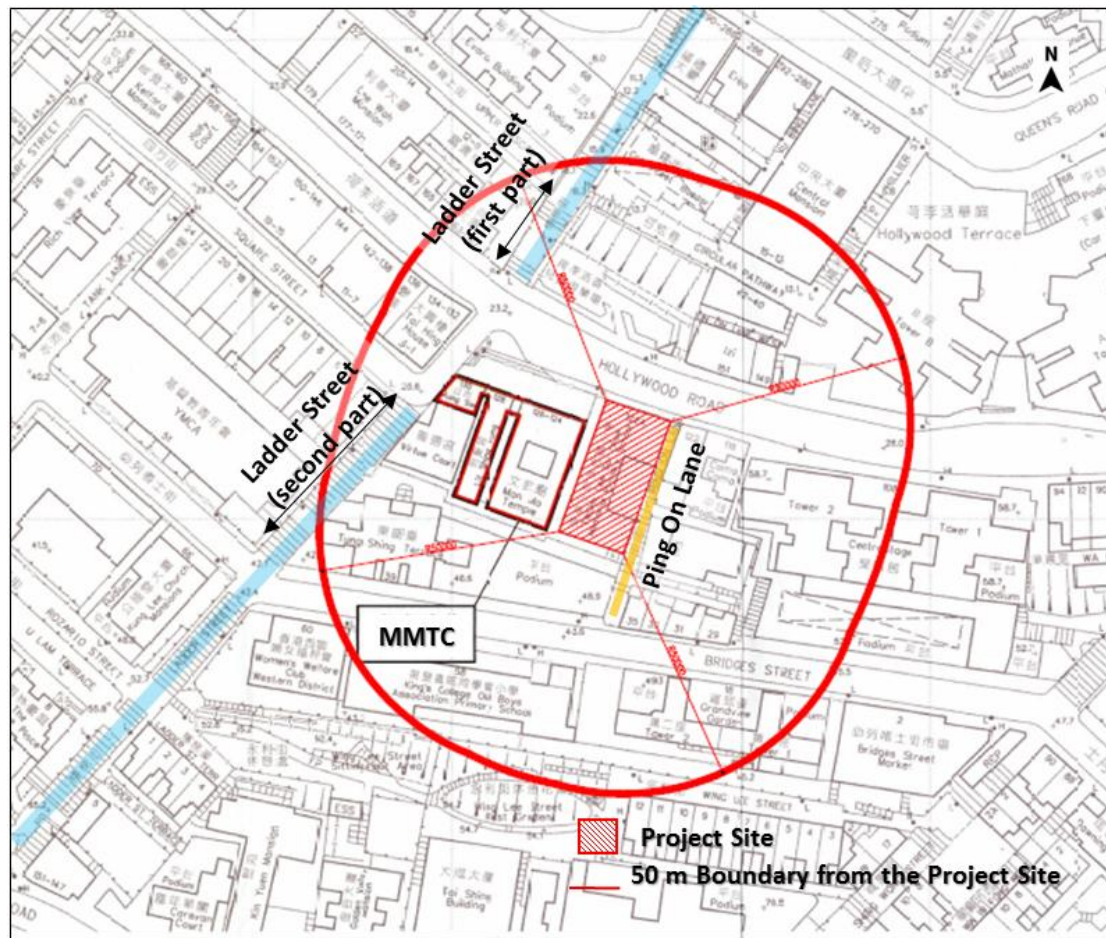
Location Plan of the Proposed Youth Hostel and the “Heritage Sites” within 50 m Boundary from the Project Site
